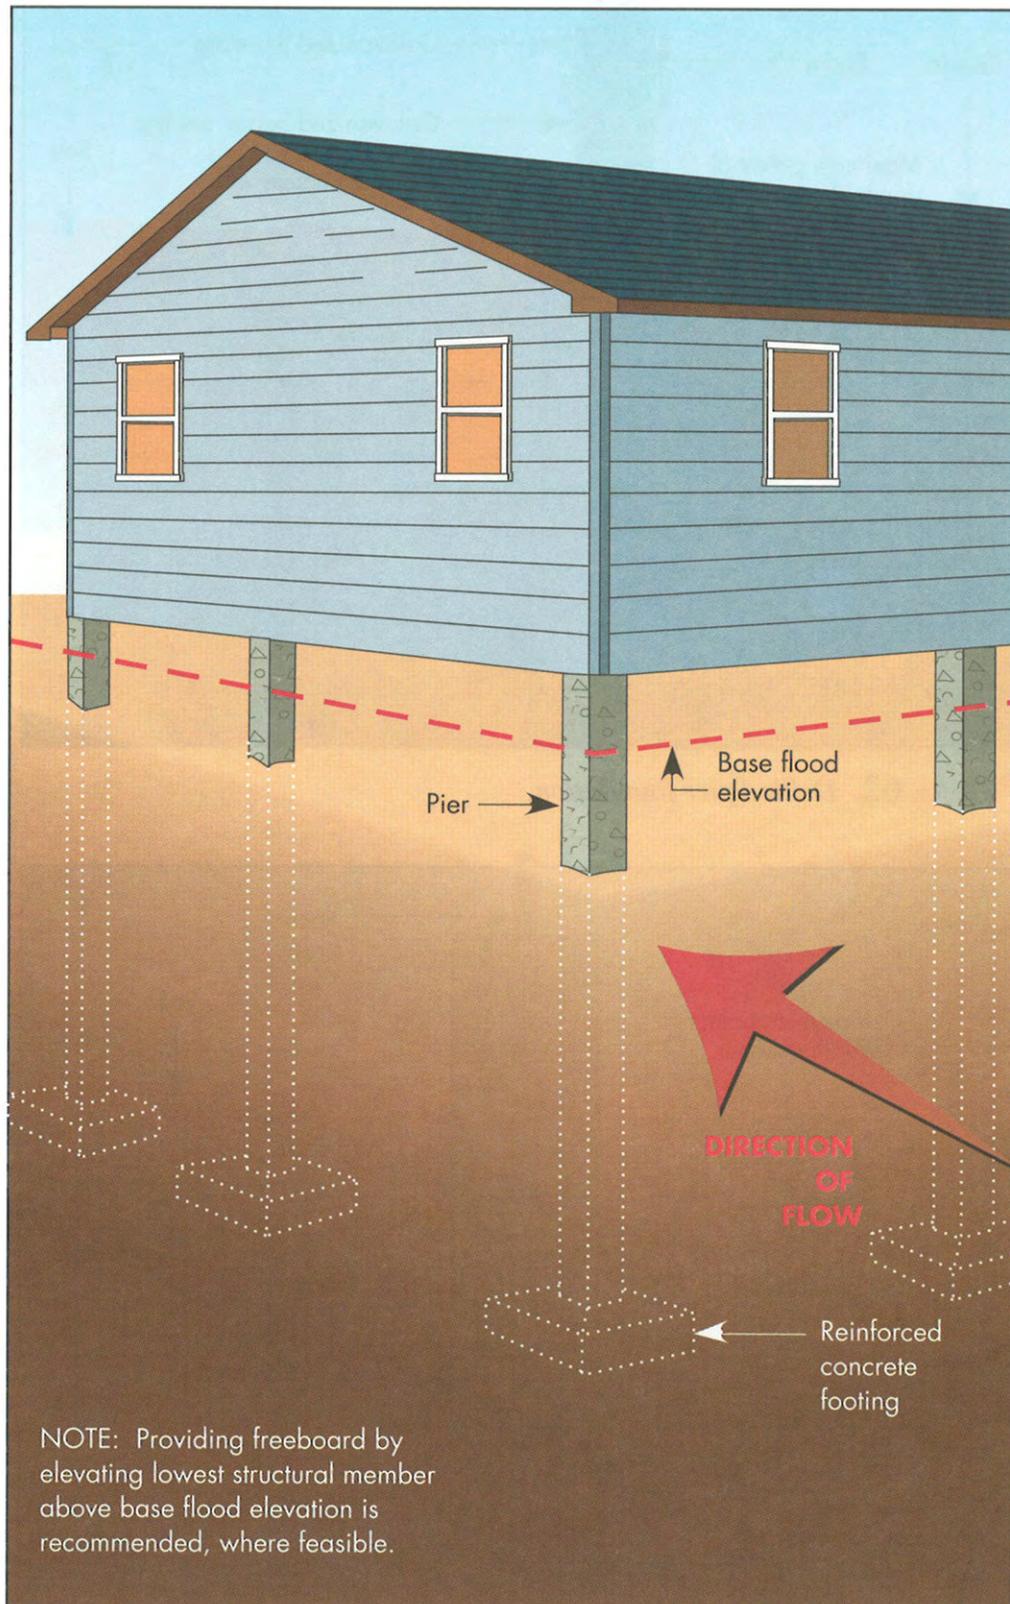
One method of support for piers is a reinforced concrete footing.
